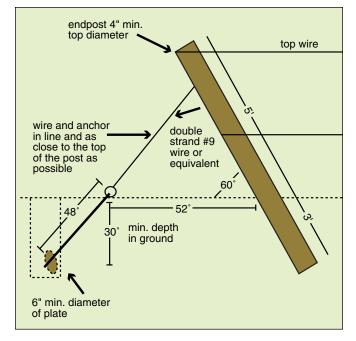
Characteristics of an end post anchoring system that uses an external anchor.
